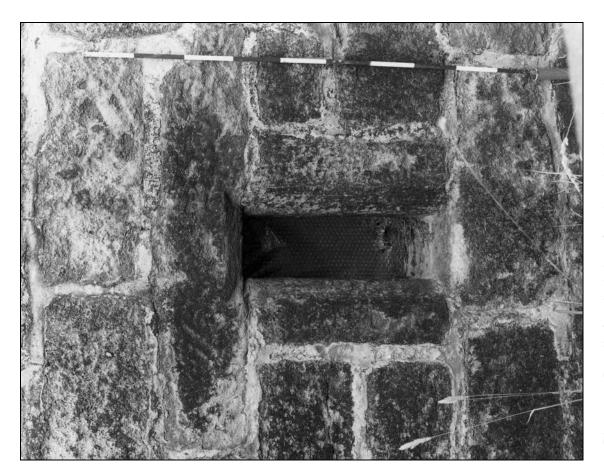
Detail of typical chamfered, arched breather, in west aable (film 2. frame 6)
